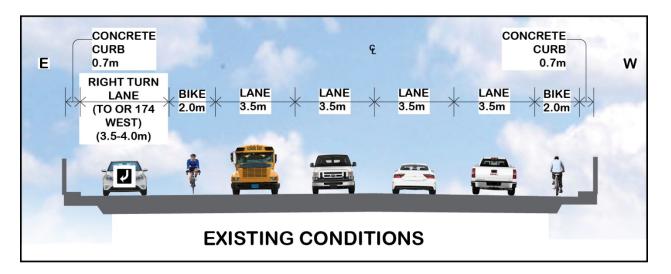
Existing Blair Road / OR174 Bridge Cross-Section
